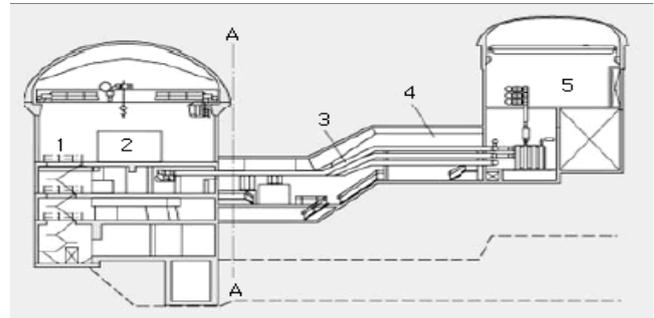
Section through a conventional power plant. With the new technology, anything right of the plane AA are eliminated.
